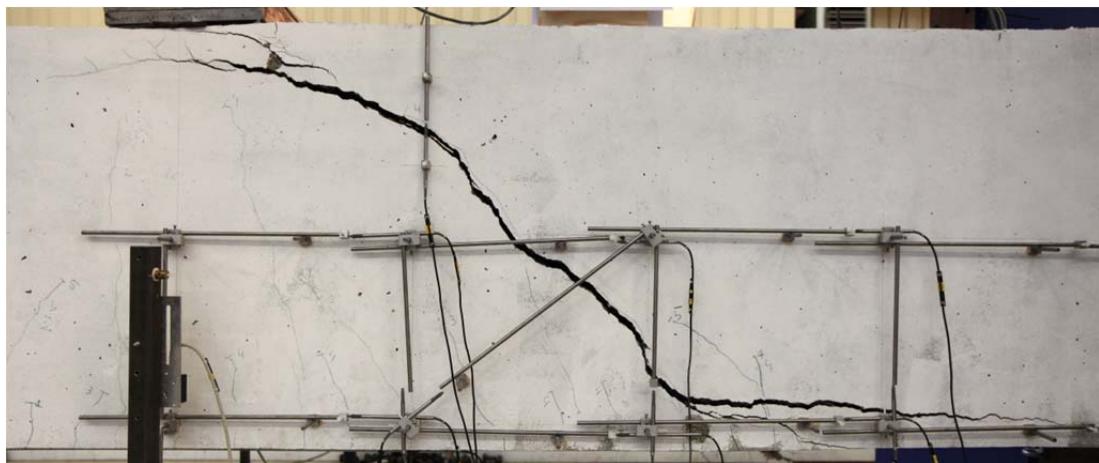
Crack pattern after failure and LVDT layout at south side of beam
